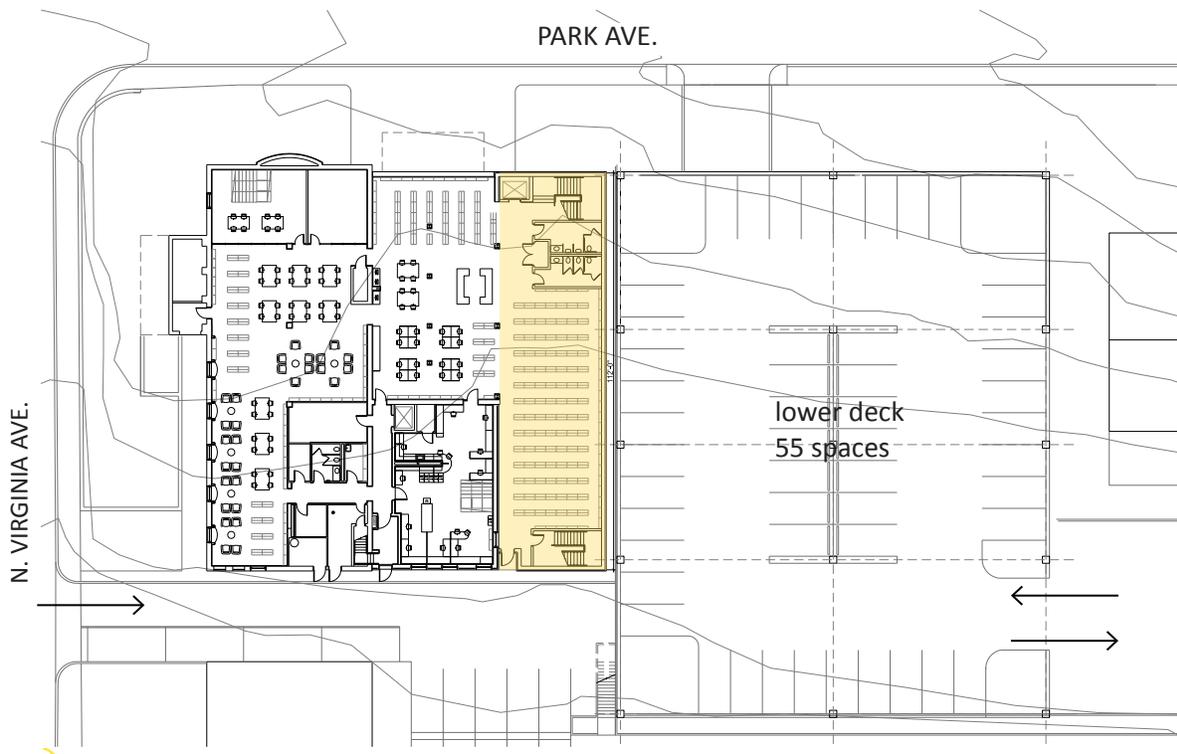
East Expansion Lower Level Plan + Parking Deck
